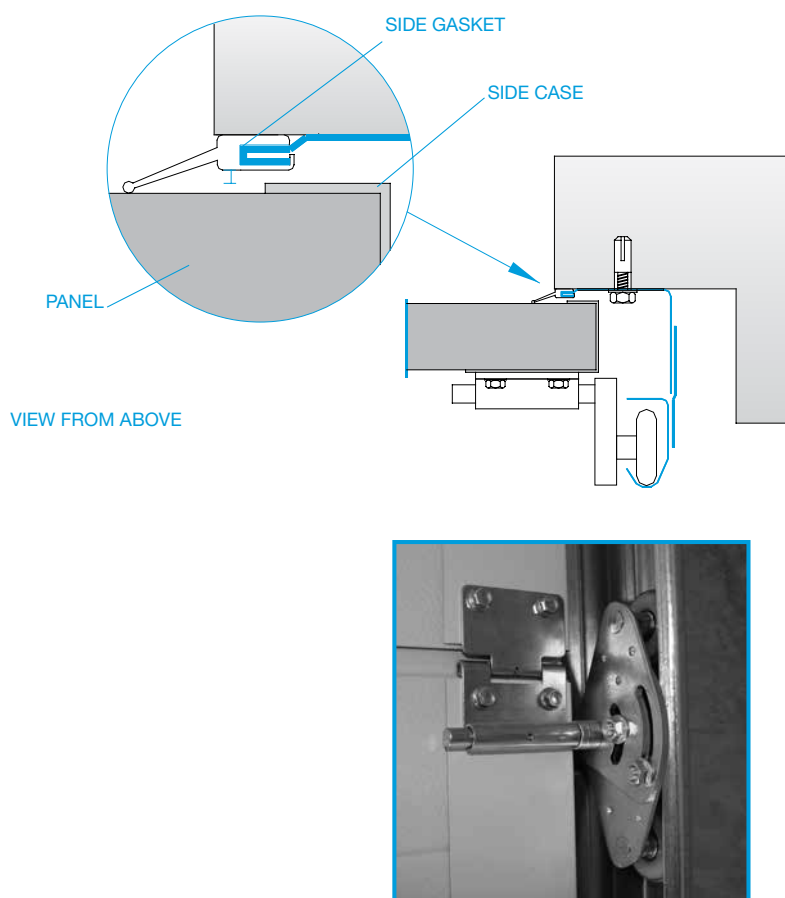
MIDDLE WHEEL CARRIAGE ASSEMBLY
